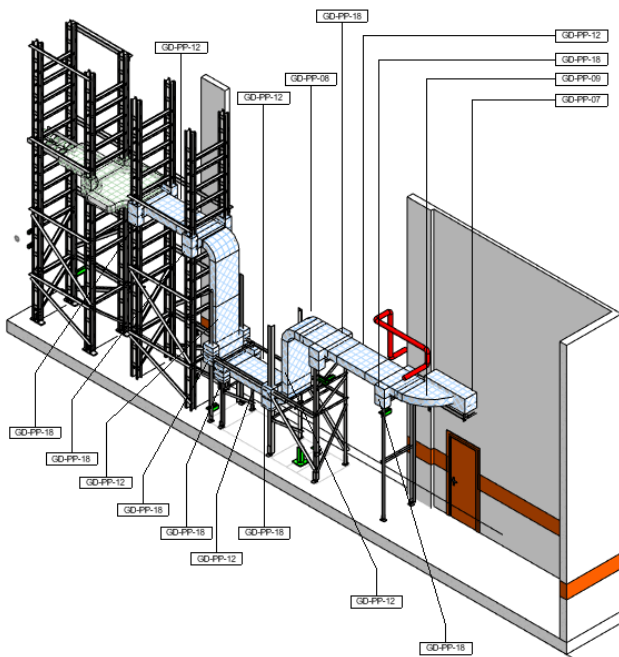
Modelling of electrical cable tray protections. Control Building, Elevation +100 Vandellós II NNP (Spain)
